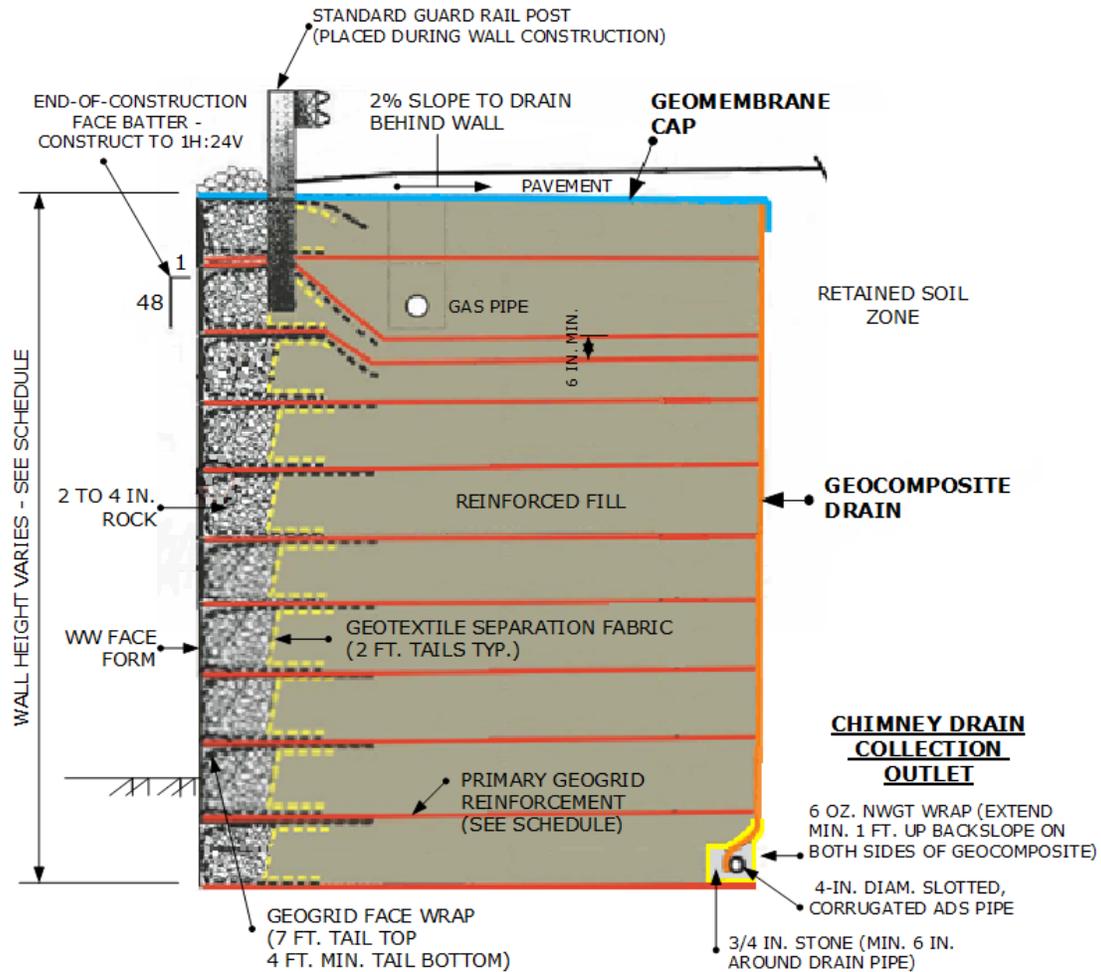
MSE Roadway Wall Incorporating Anti-Seepage Measures
